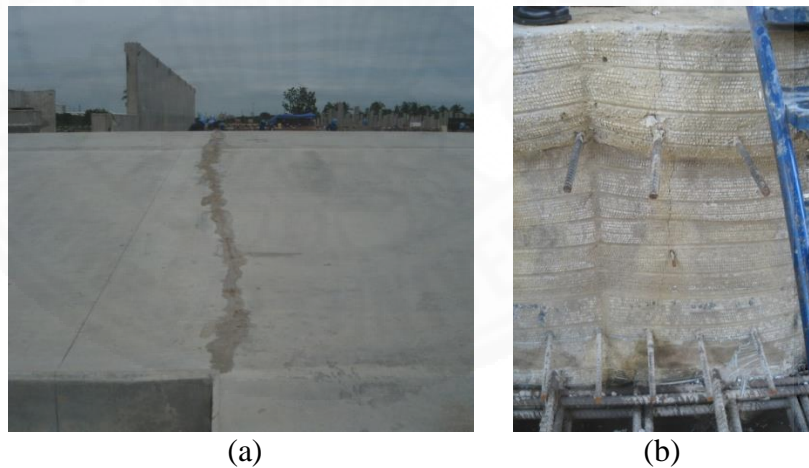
Cracking in mass concrete due to thermal stress
